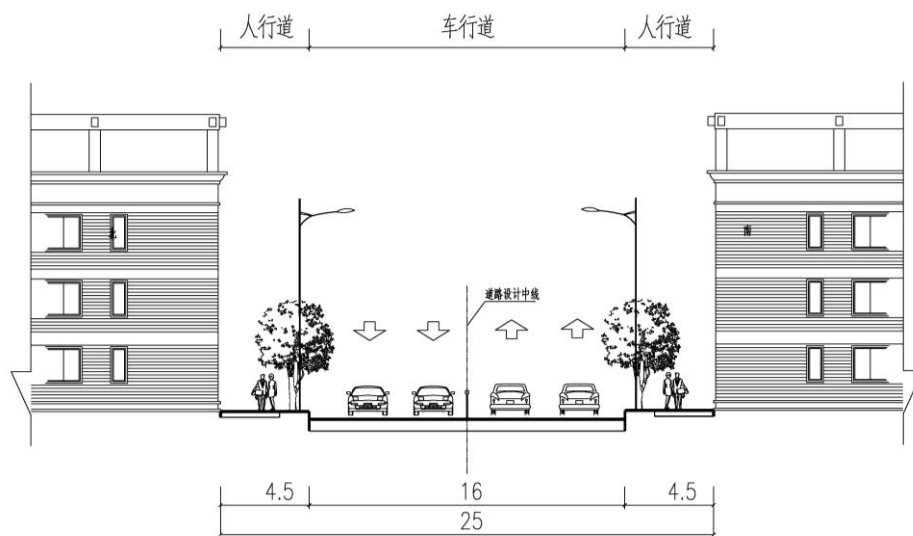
Sectional View of Existing Biyun Road (Handan Road ~ Wenchang Road)
